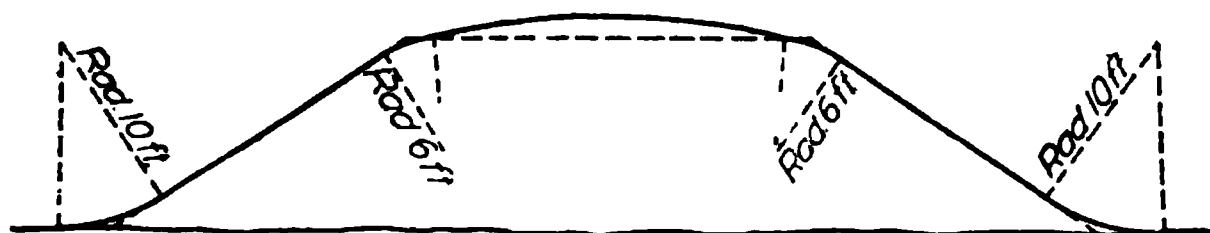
CROSS SECTION FOR EMBANKMENT.
